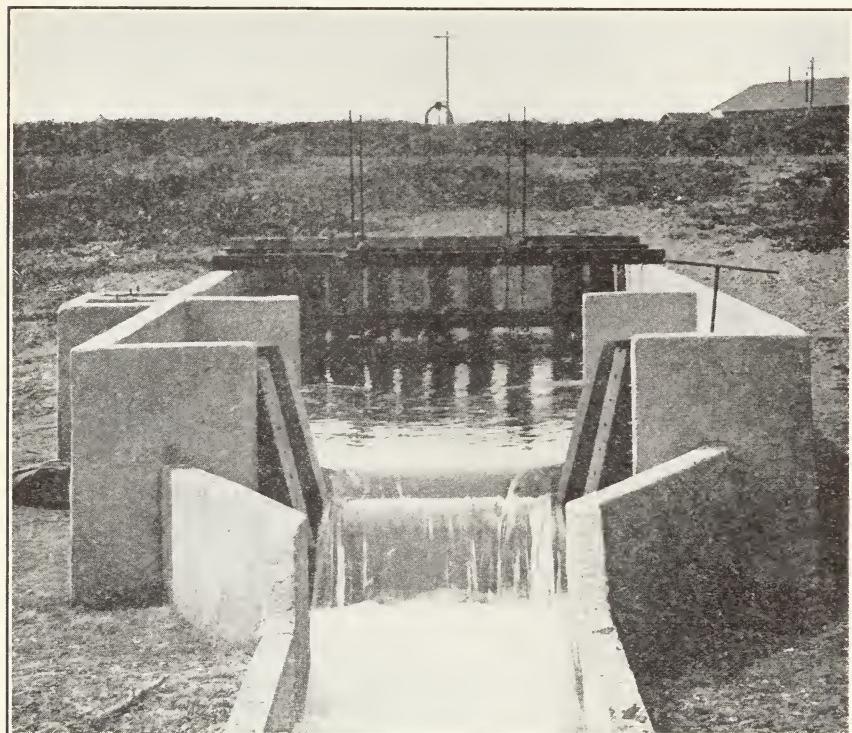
Concrete standardizing box, Davis Field Laboratory
